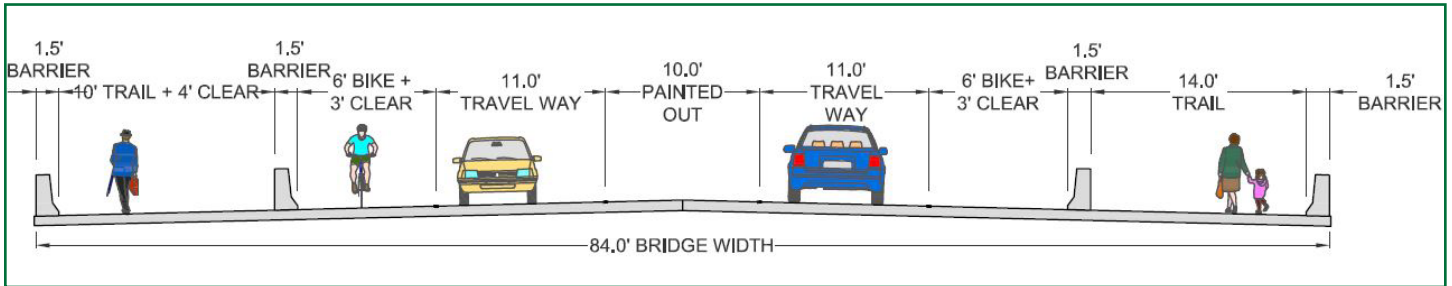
Tower Terrace Road, Near Winslow Road in Marion, 2018
